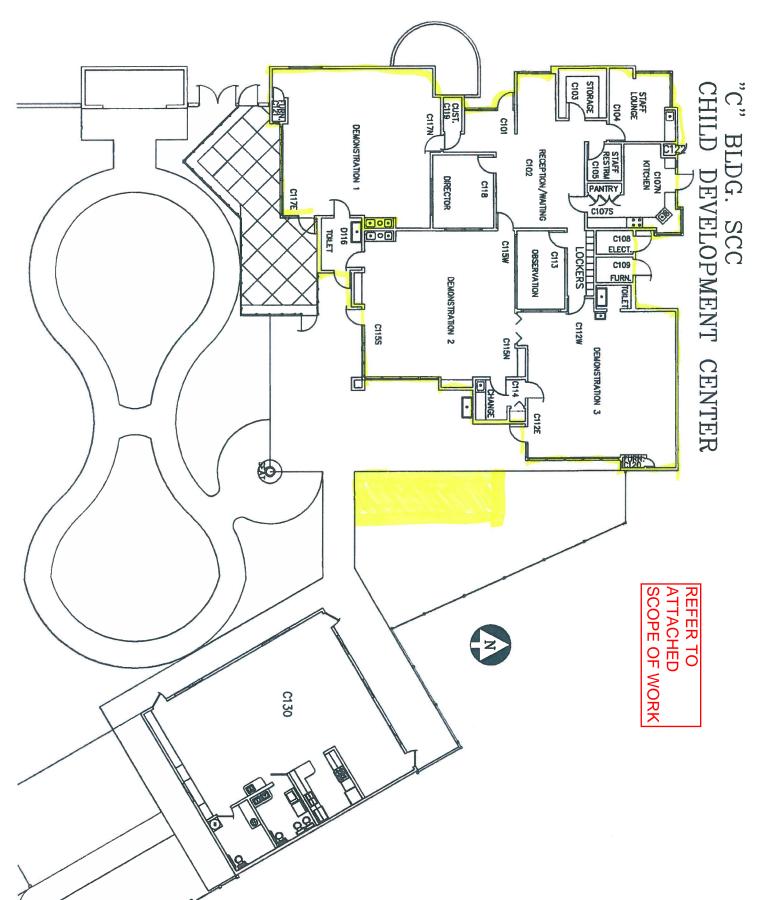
SANTIAGO CANYON COLLEGE SITE PLAN
